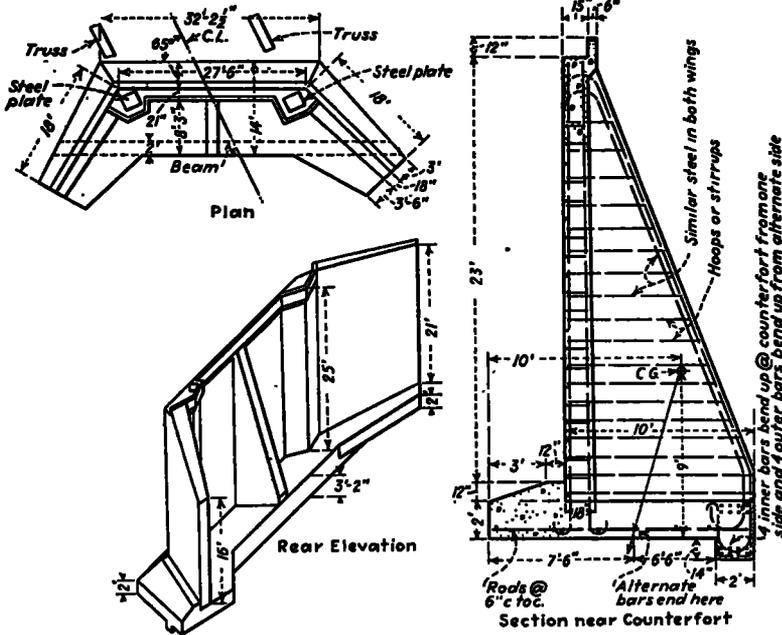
Bridge Abutment in which Wing Walls Serve as Counterforts. Courtesy of Engineering News Record, April 8, 1937.
